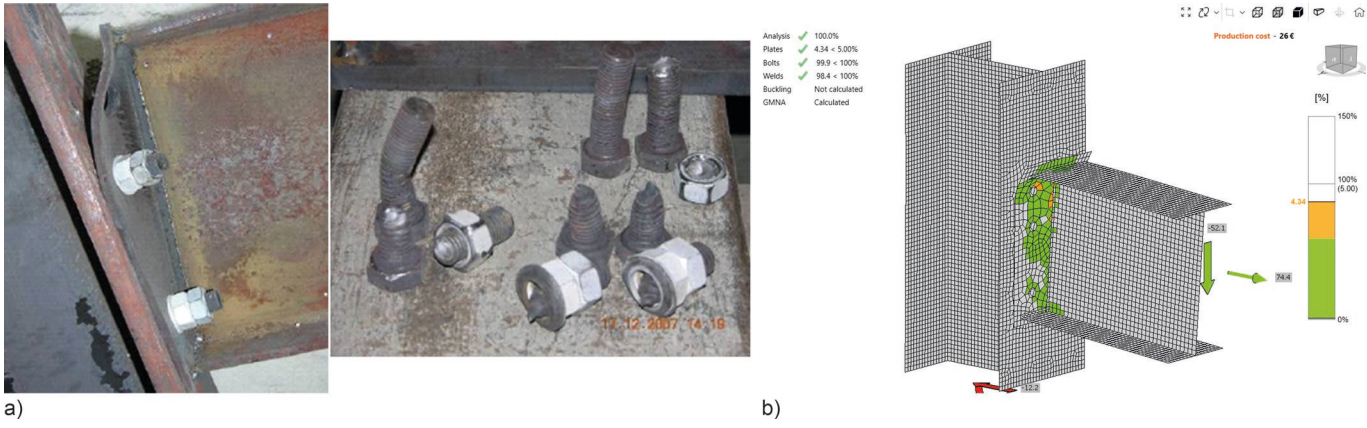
Deformed shape of the connection with 8mm endplate at 550°C: a) test and b) CBFEM
